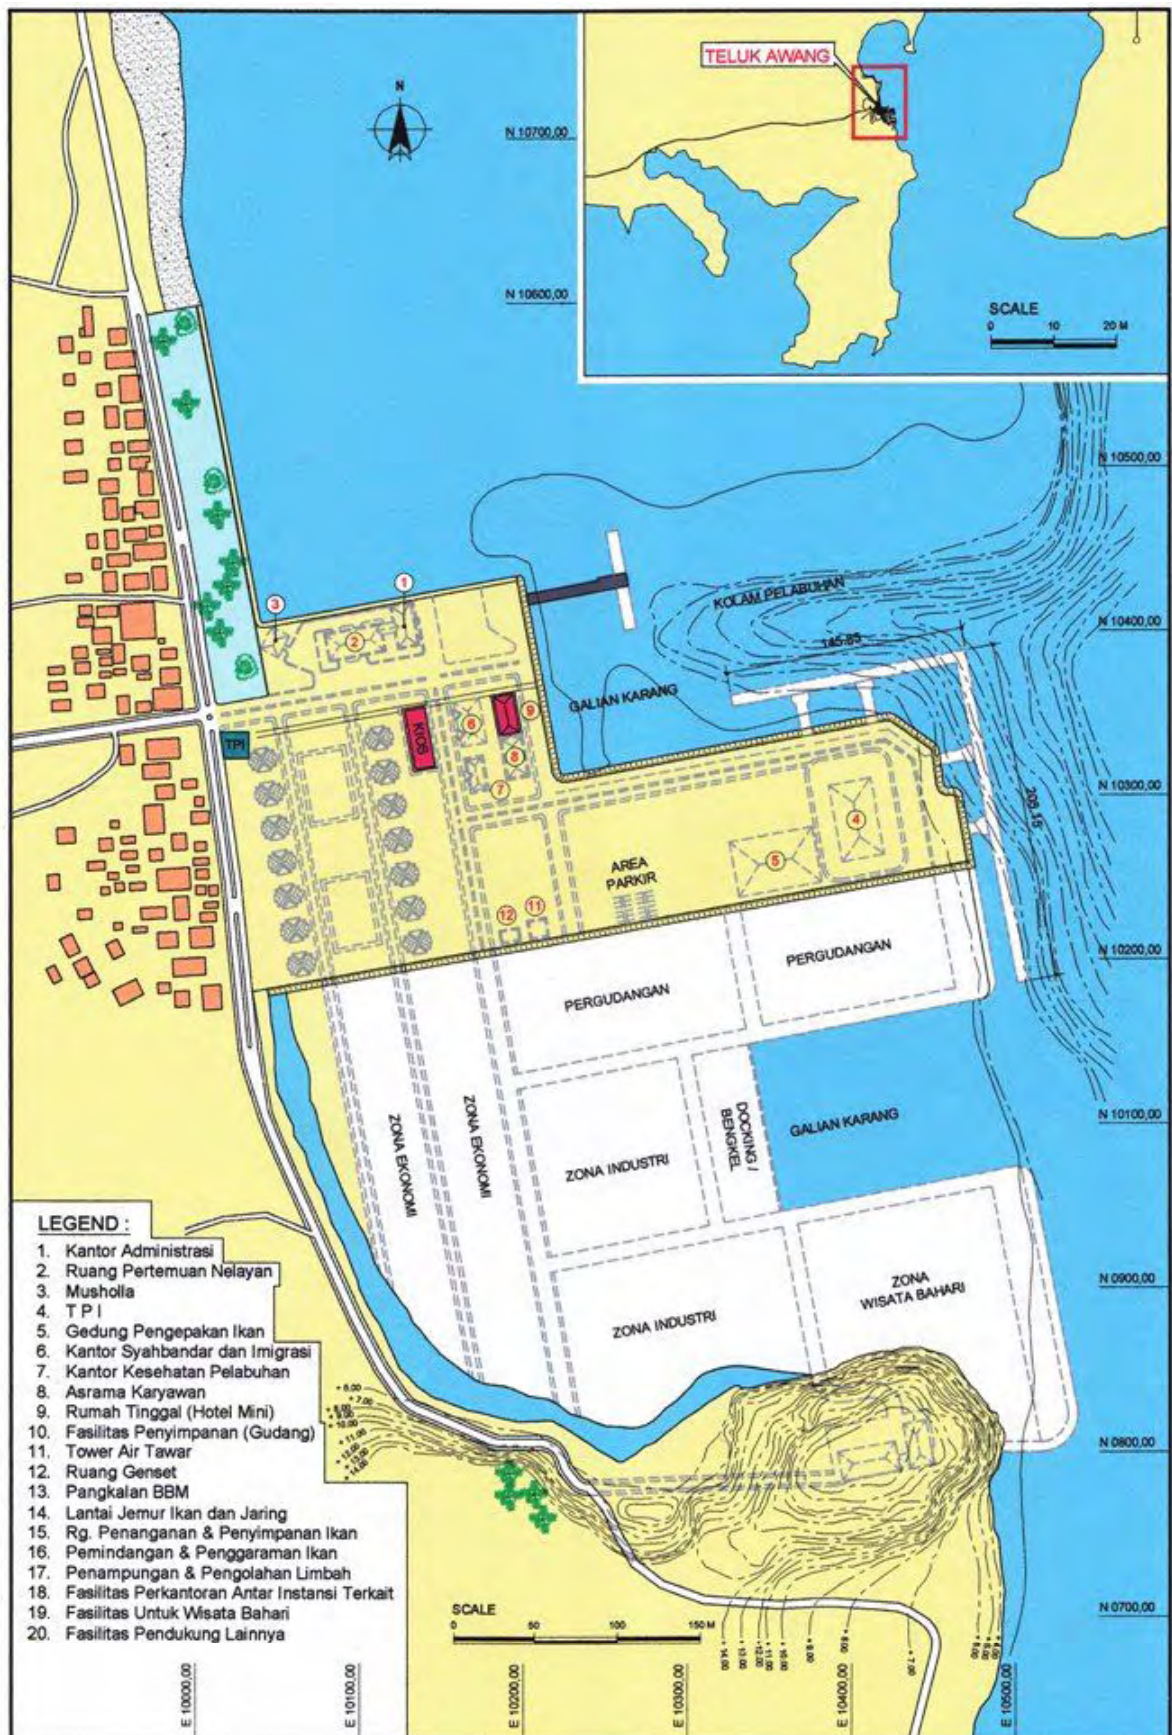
PPN Teluk Awang development plan (Source: Survey team)
